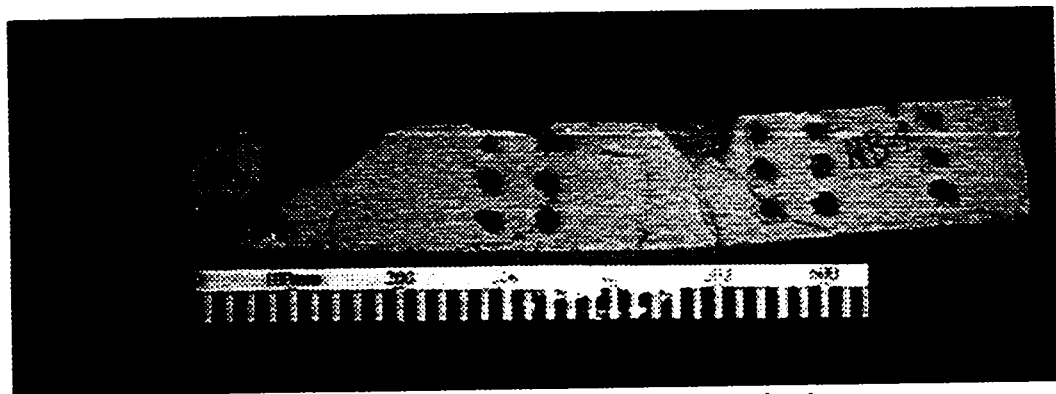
Typical flexural failure of loaded reactive beams
